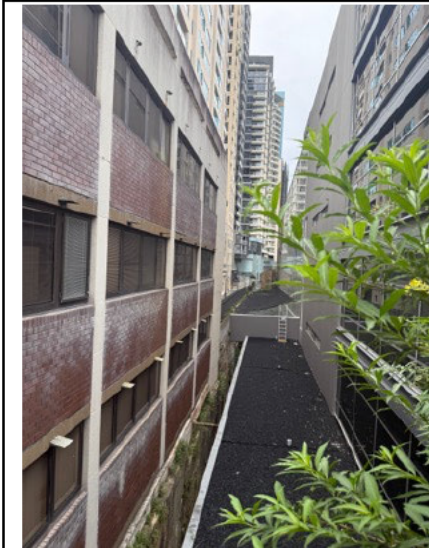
, Western elevation of subject property looking south, with former Lend Lease building on RHS. Note the sandstone cutting which supports the subject property – the same cutting that can be viewed from inside former Lend Lease building, AW 23.02.26
